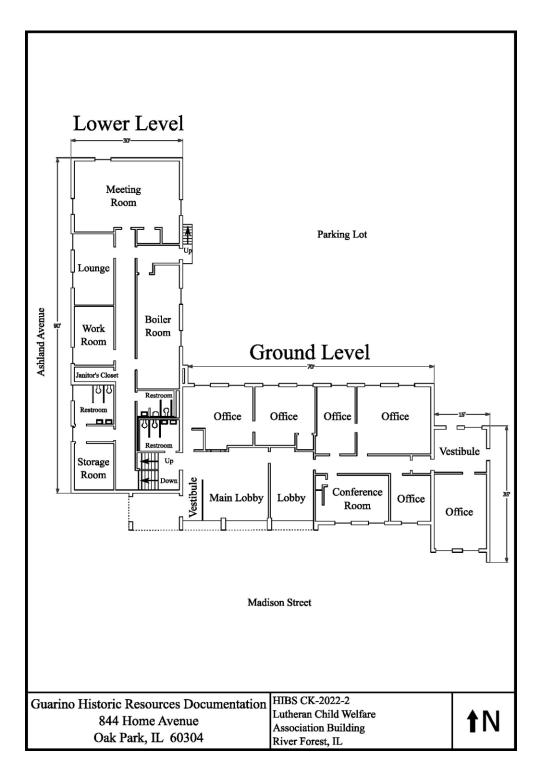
Floor Plan of First Floor (right) and Lower Level.
